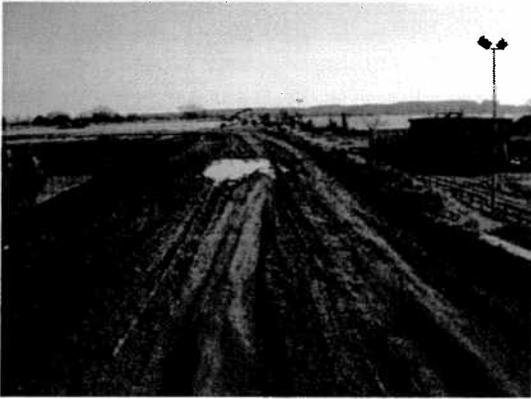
Partially Drained and Excavated West Bottom Ash Pond
